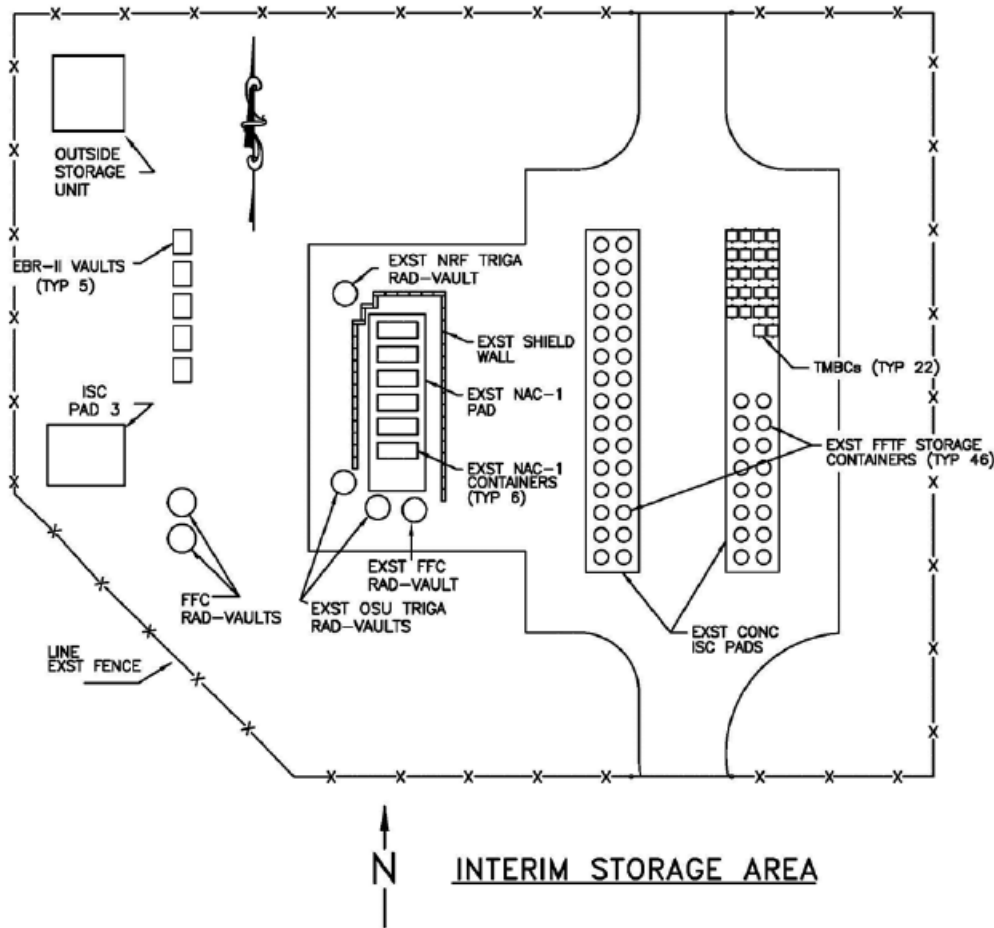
200 Area Interim Storage Area (ISA) Site Layout²⁴
